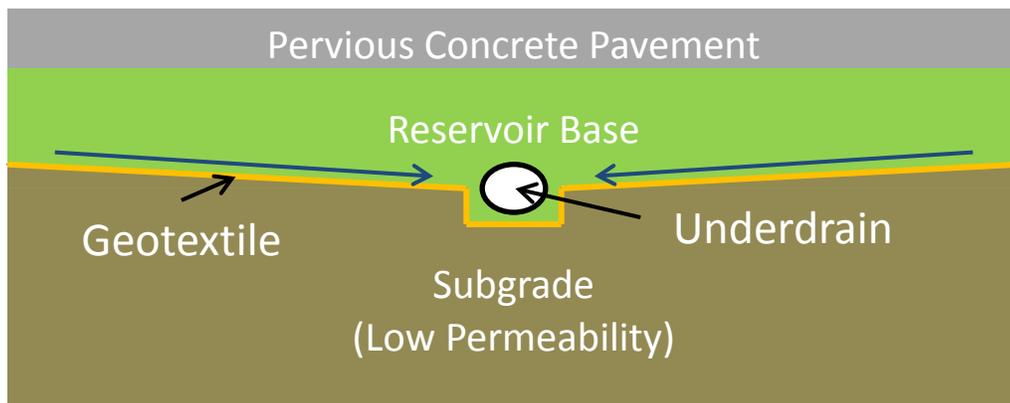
Underdrain Pipe for Low Permeability Subgrade Soil
